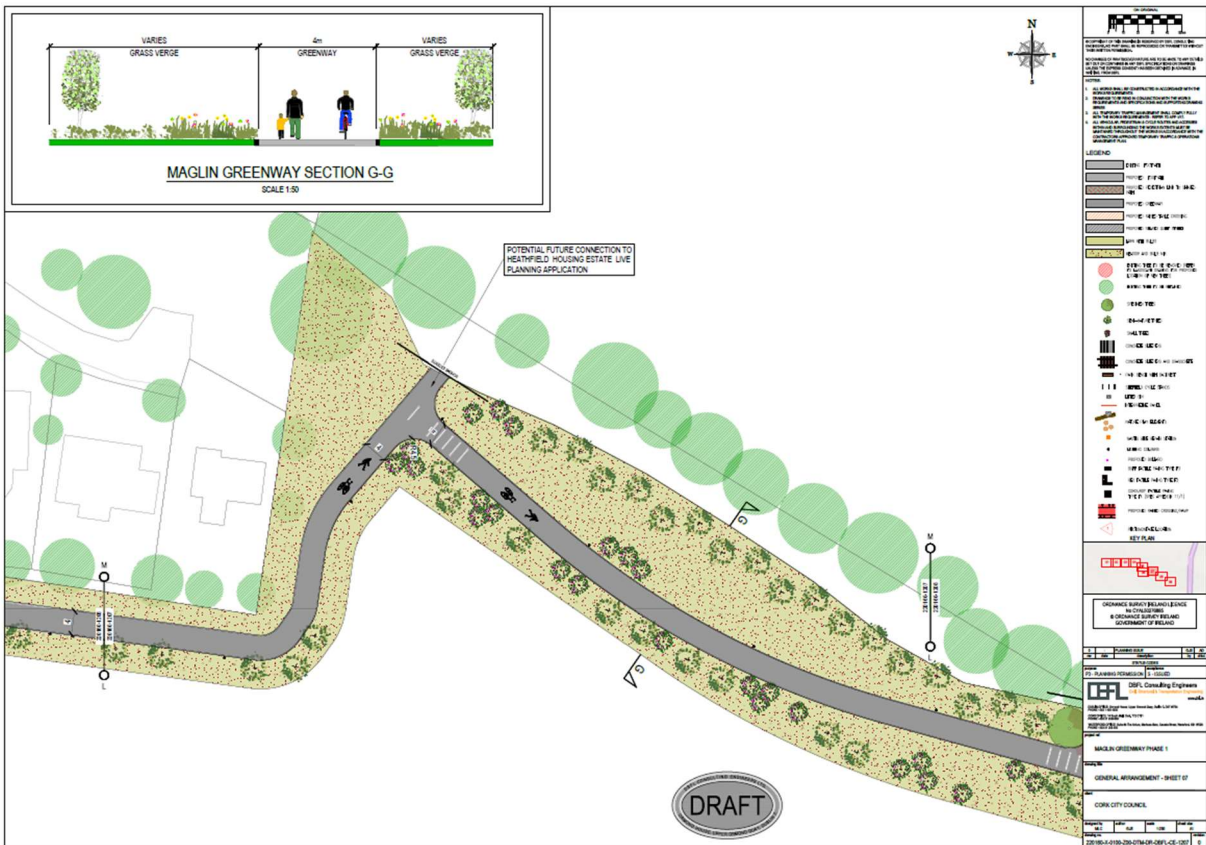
Proposed Route Detail 7 – Alignment from boundary of Limeworth estate to the west and agricultural lands to the east.
